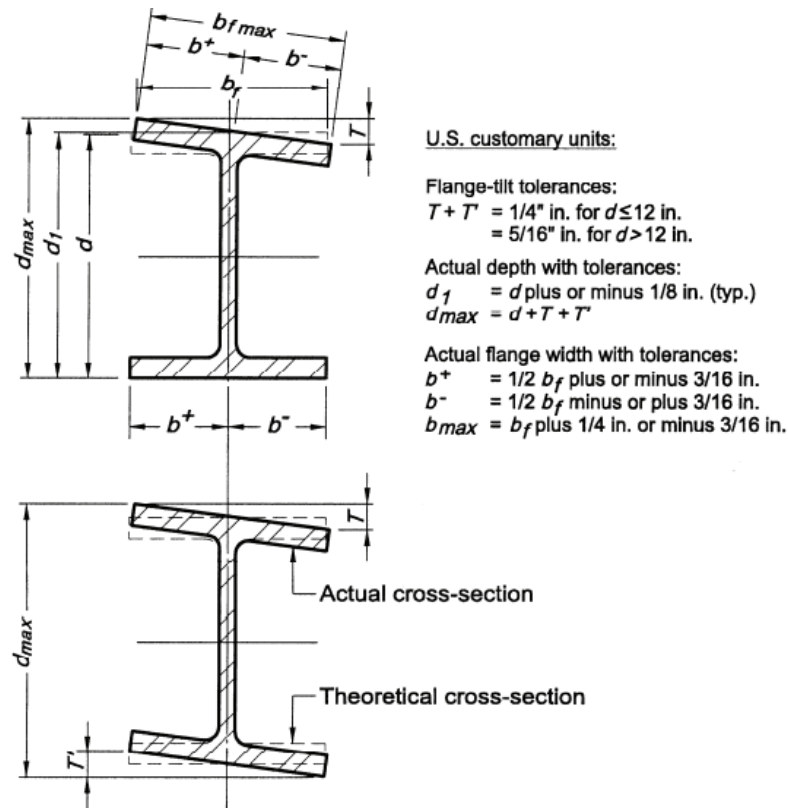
Mill tolerances on a W-shape cross section [after (AISC 303-16)]
